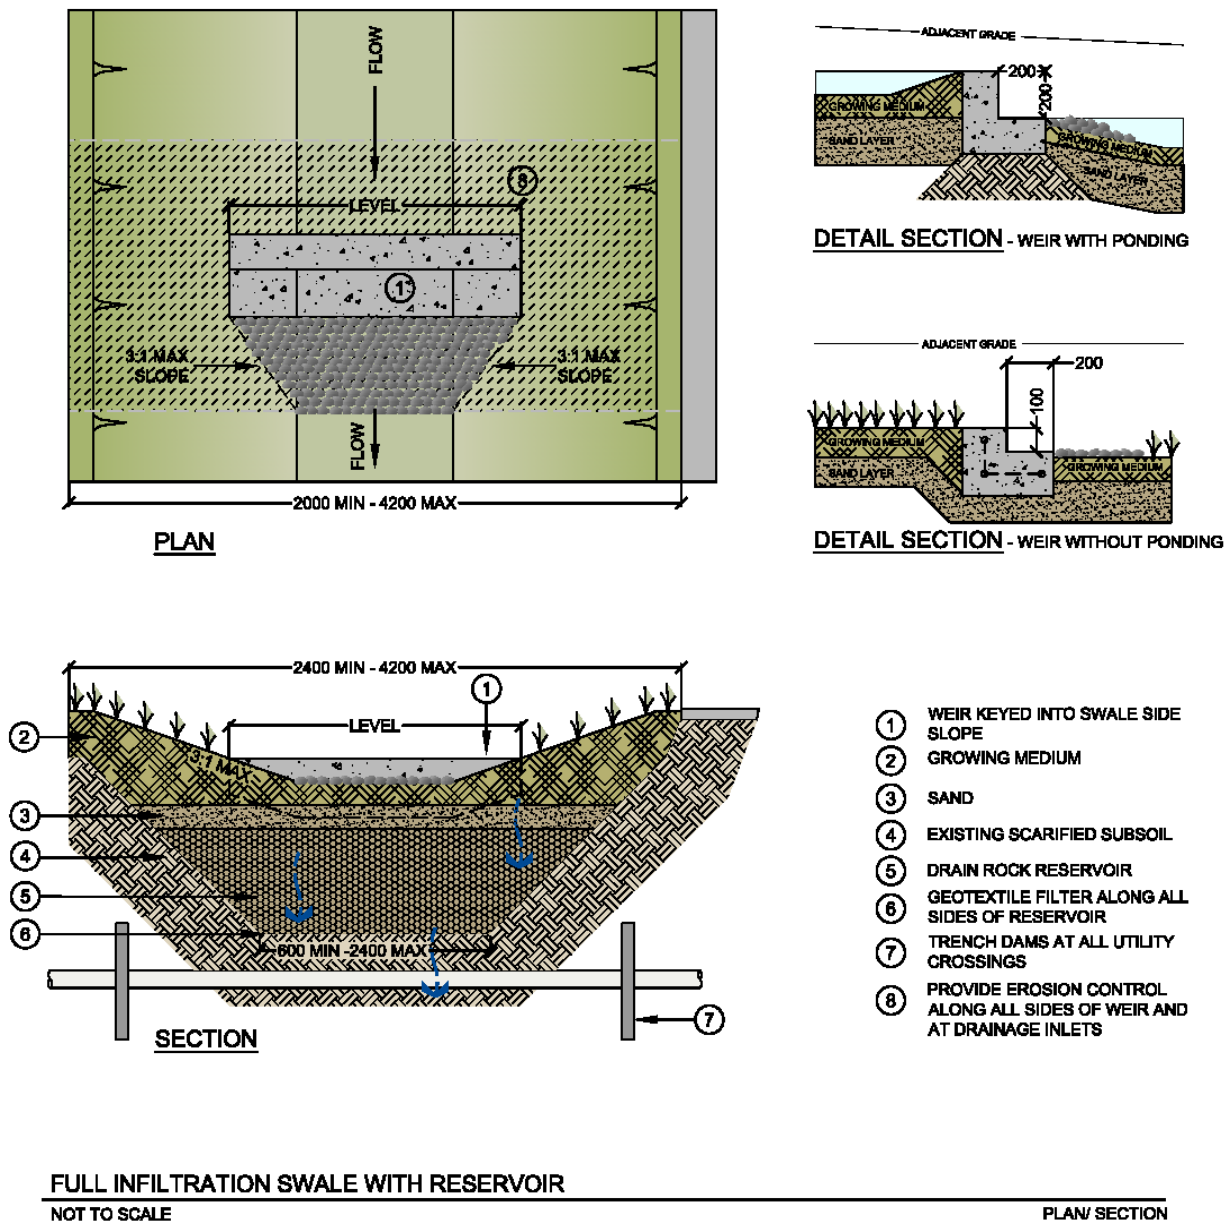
Full Infiltration Swale with Reservoir (Not to scale, Plan/Section)
